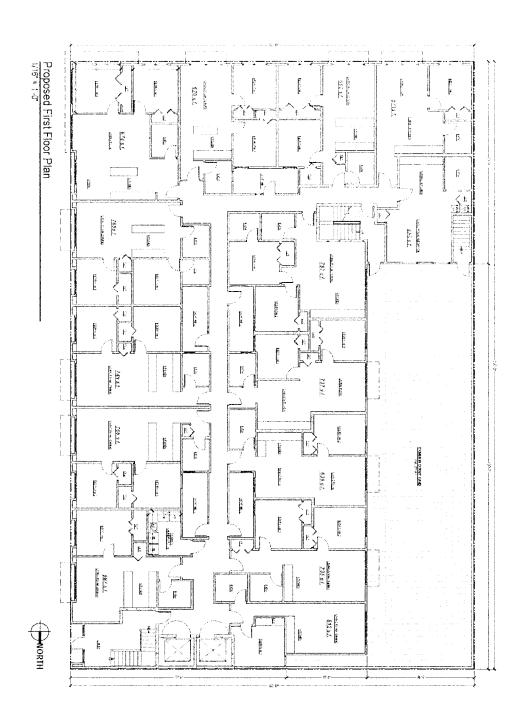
First Floor Plan 480 Potrero Avenue Source: Sia Consulting, August 2012
